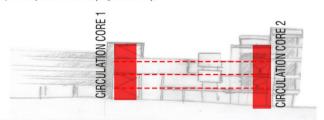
INTER-CONNECTING WALKWAYS
